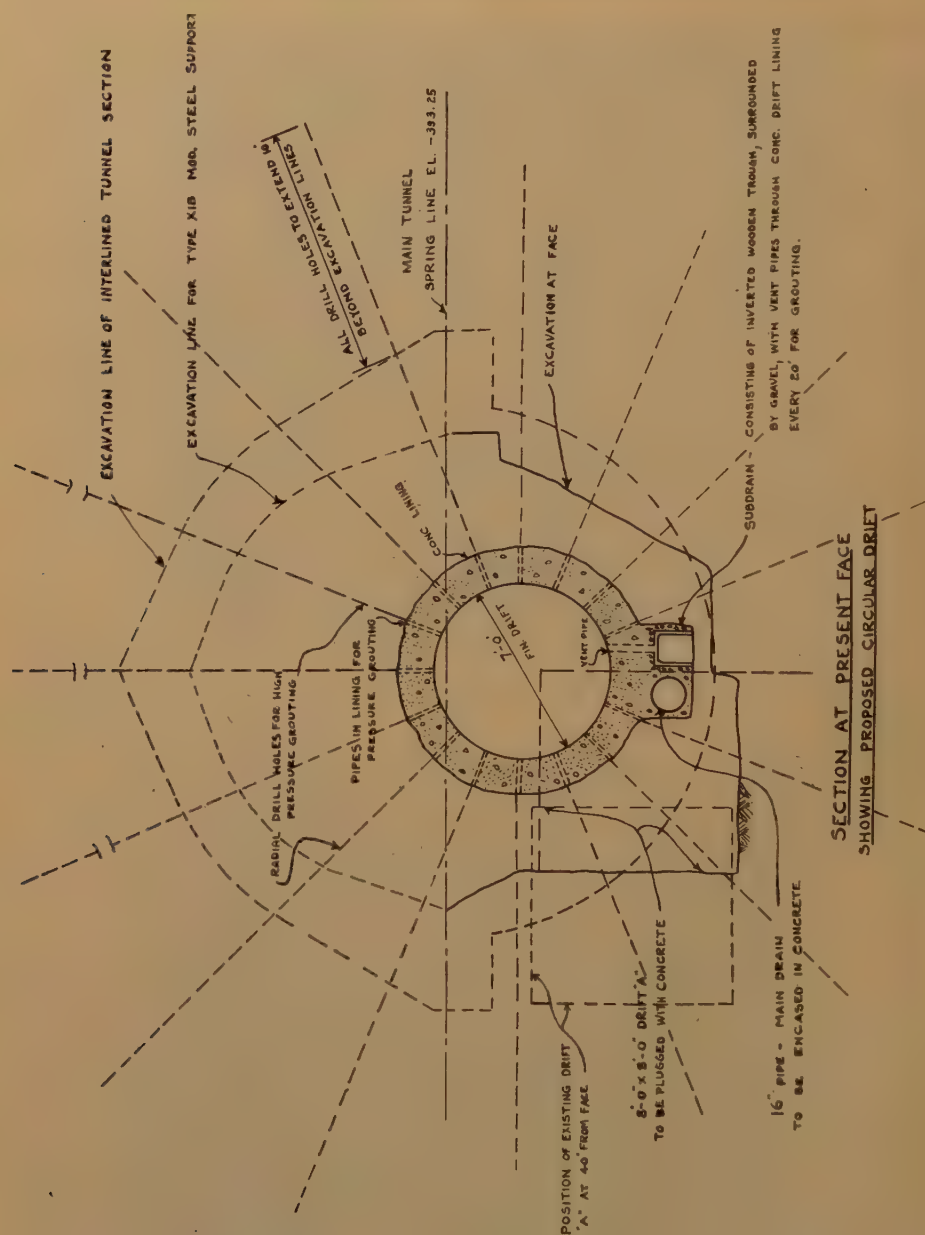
DETAILS OF CONCRETE-LINED PIONEER DRIFT B.
